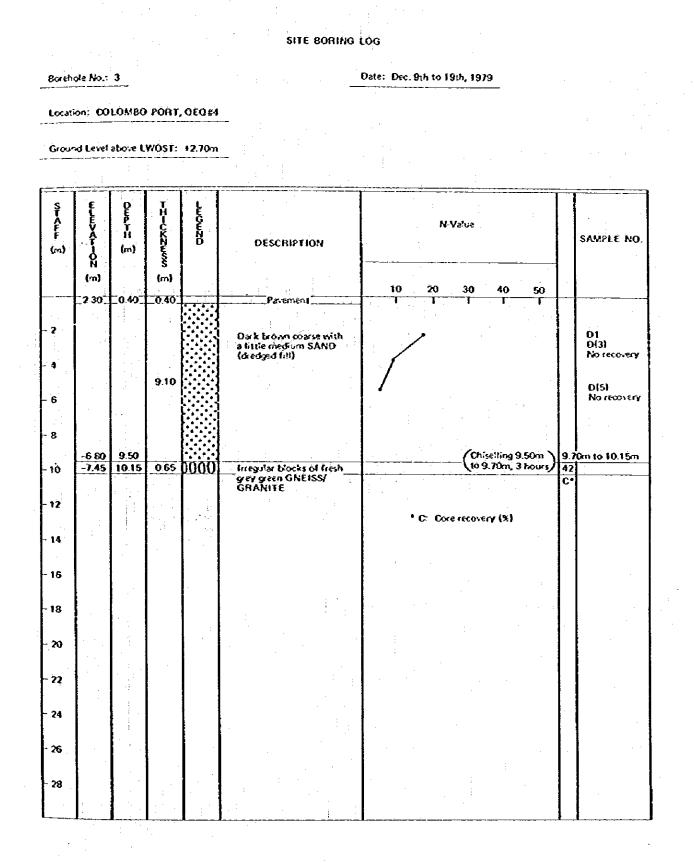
Site Boring Log (Borchole No. 3)
